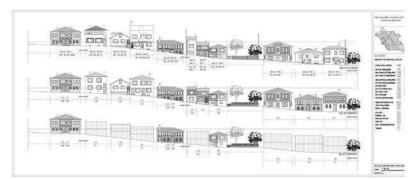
Silhouette 1 Cami Street South Facade Proposal (*Drawing: Aydın, 2017*).
